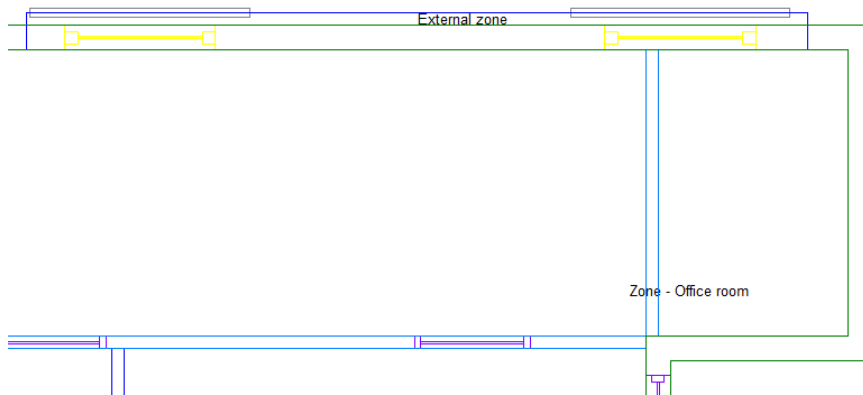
Plan view of "3d shades" applied 10 cm from the wall, in front of two windows
